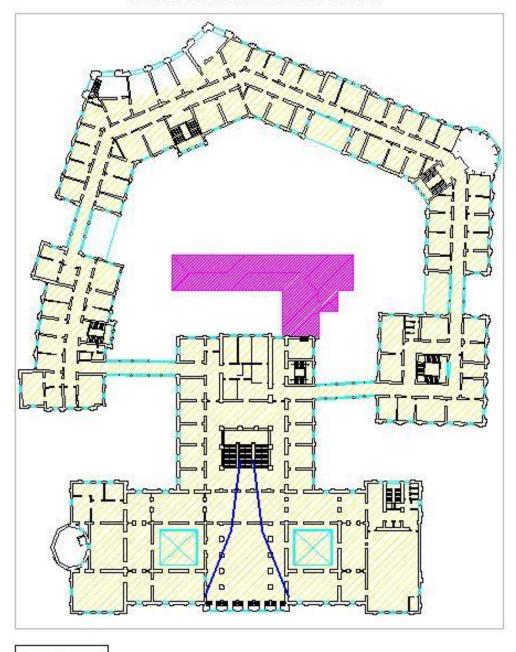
GROUND FLOOR BUILDING DESIGN
